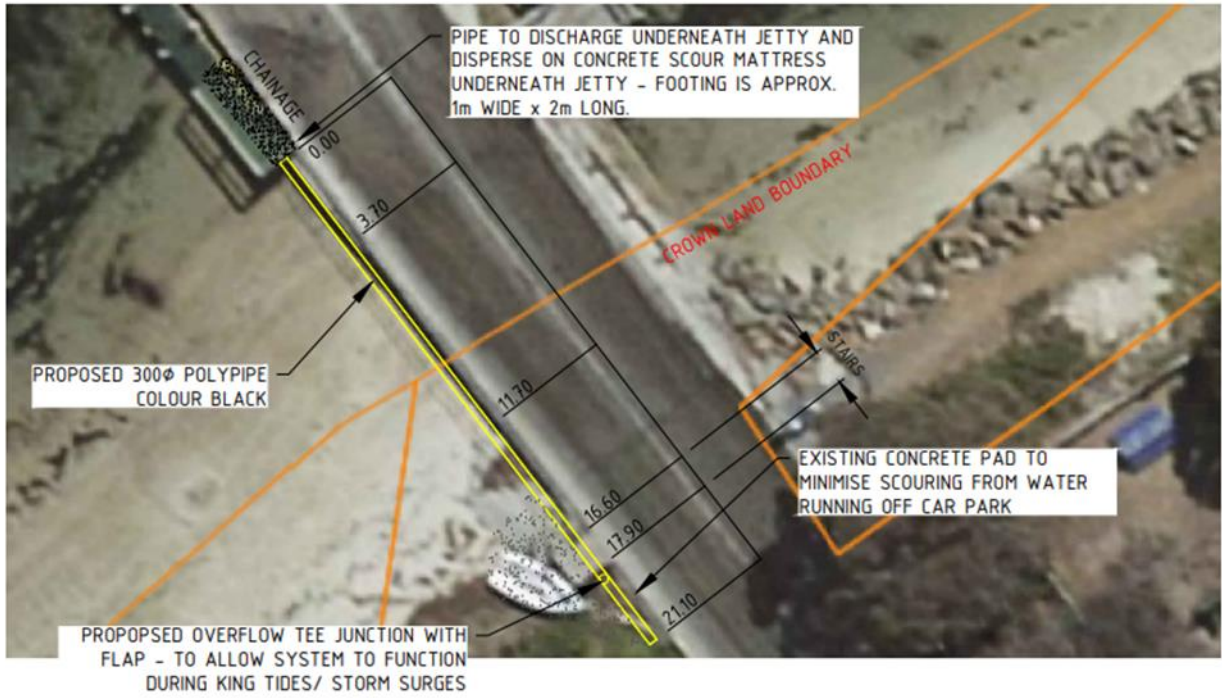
Plan view of proposed stormwater discharge location at the boat ramp (Scale 1:200. Image source: Sorell Council).
